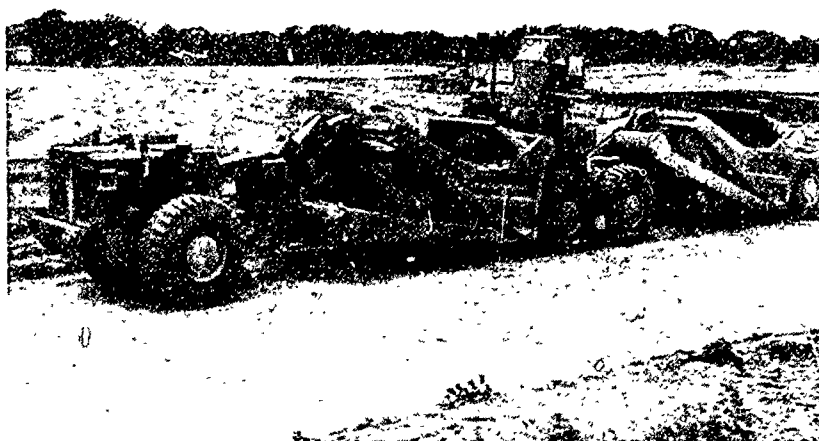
LeTorneau equipment L-140 electric digger,
